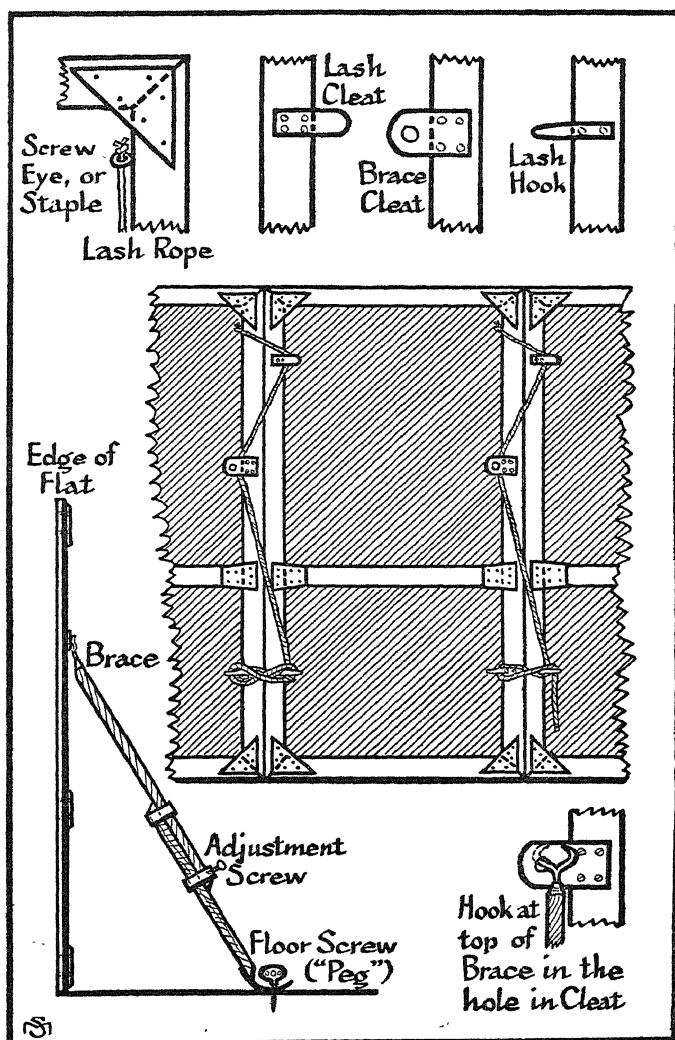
METHOD OF LASHING AND BRACING FLATS
